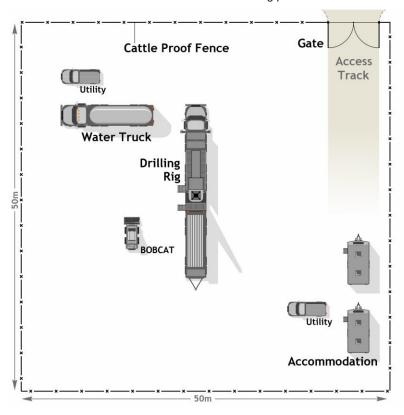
Proposed Water Bore Lease Area Layout (figures not to scale)
